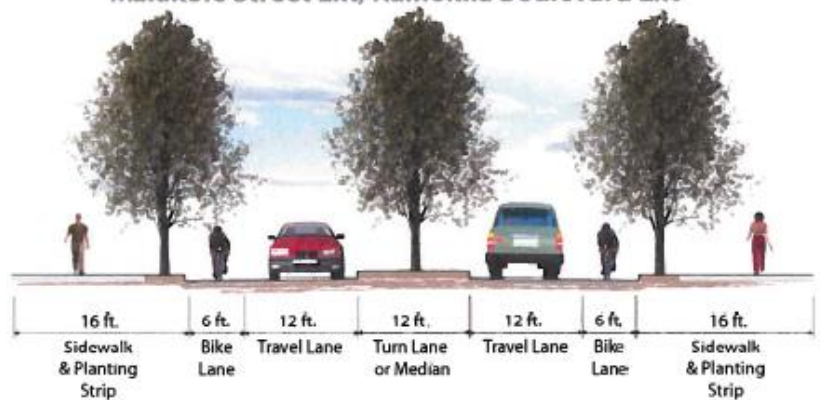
KCDD typical cross section of 2-Lane Avenue (ROW 80')
